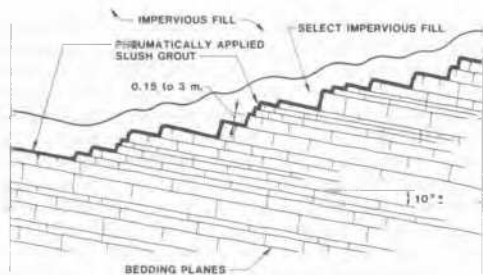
UPPER DAM RIGHT ABUTMENT CORE FOUNDATION TREATMENT
